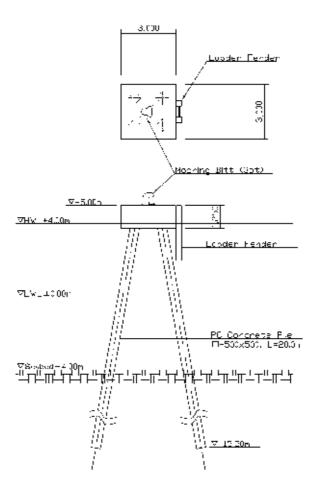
Typical plan and section of Mooring Dolphin
